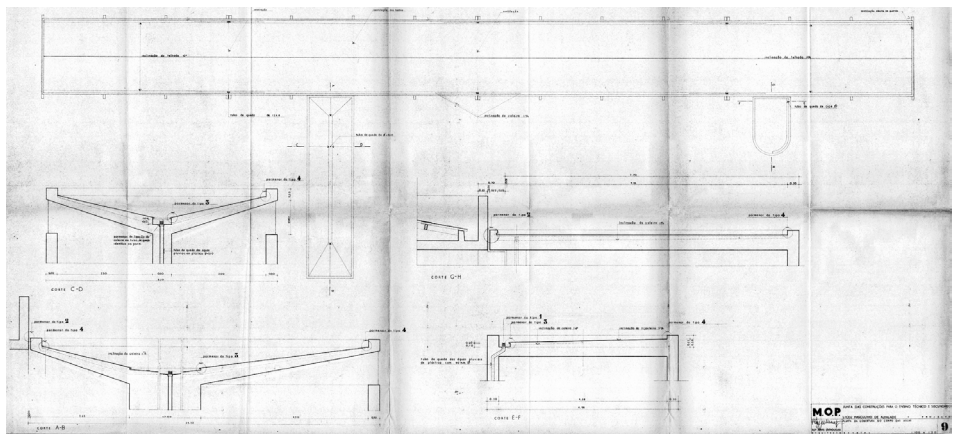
Liceu Padre António Vieira. Floor plan, cross sections and details of the roof of the body housing the classrooms. Design Project (1961).
